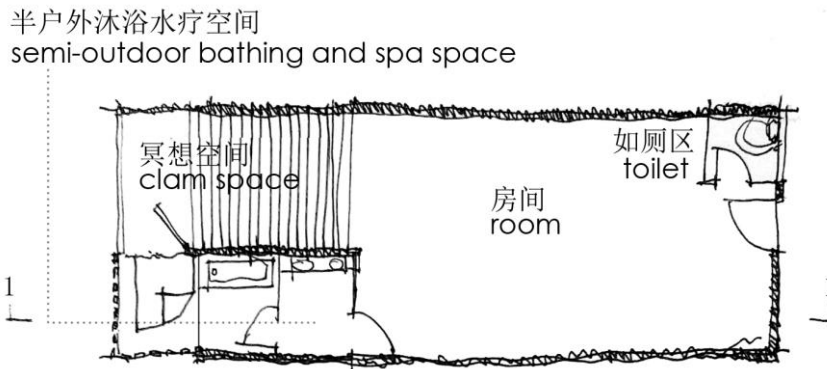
Guest room bathroom plan in Garden Terrace Miyazaki resort and hotel
